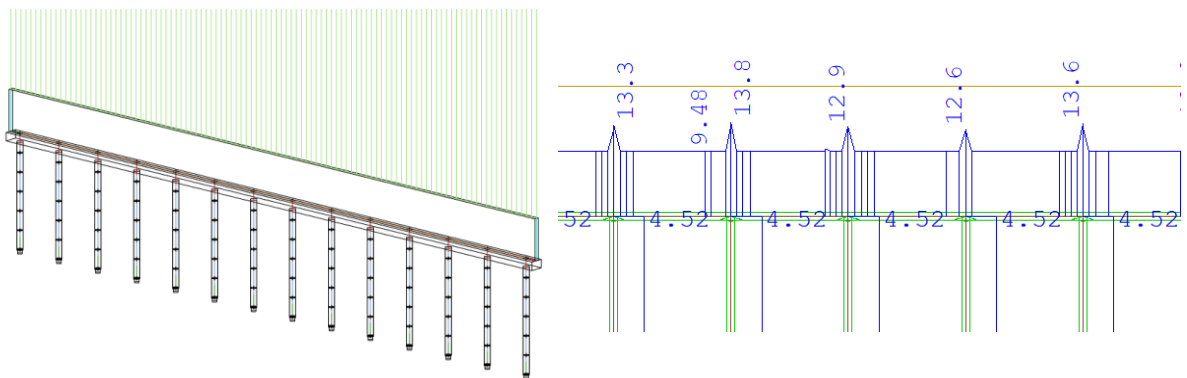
Area of reinforcement,  $\text{cm}^2$ . Model with wall part.
